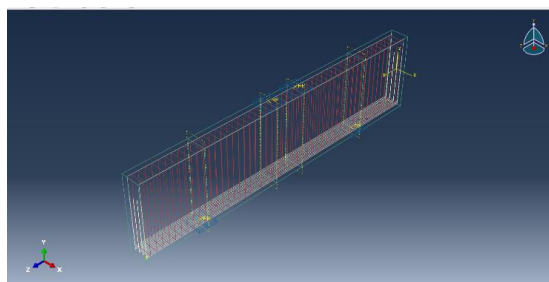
Assembly of CFRP Longitudinal bars and stirrups
